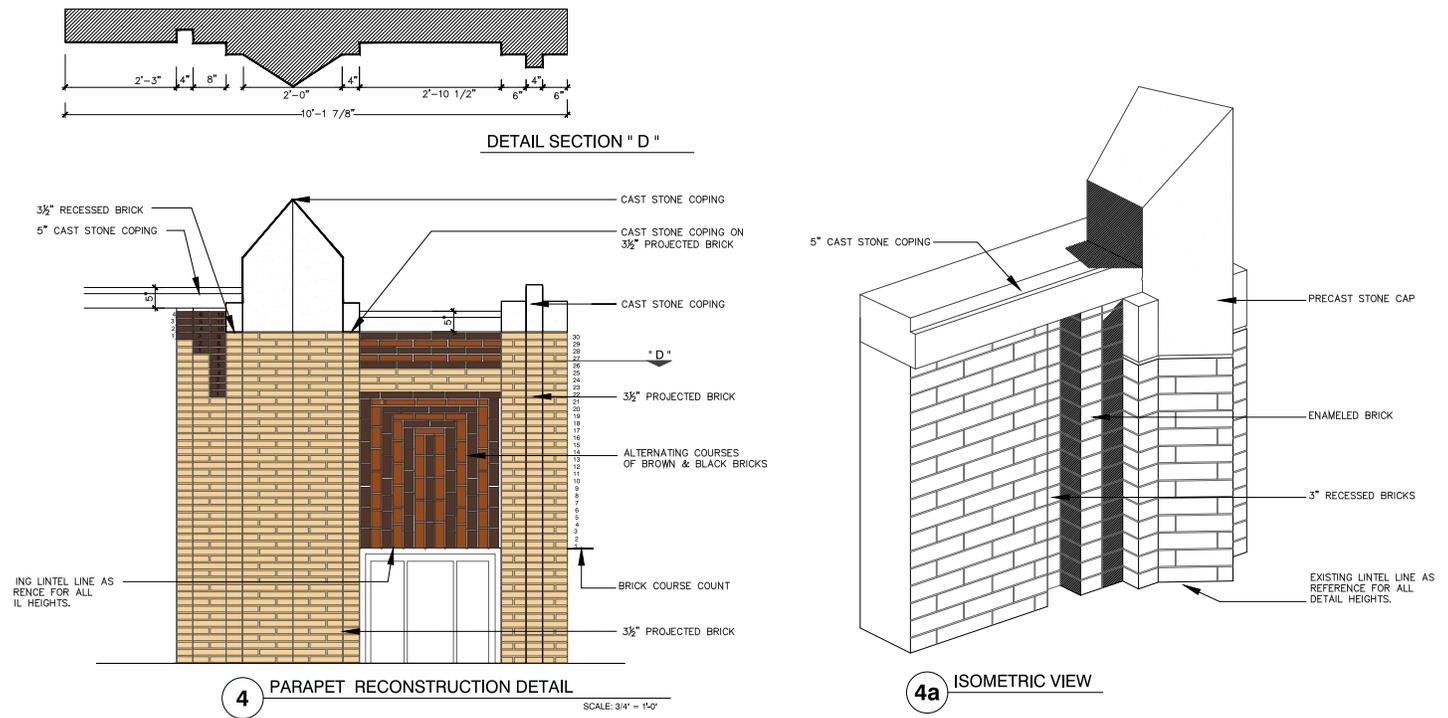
Detailed plan of the proposals for the restoration of the parapet. The drawings in plan, elevation and isometric allow an excellent understanding of the architectural elements that converge in the building, in addition to providing data on the materiality: carved stone, bricks, stucco, among others. Source: Danois Architects, P. C. (2020)
